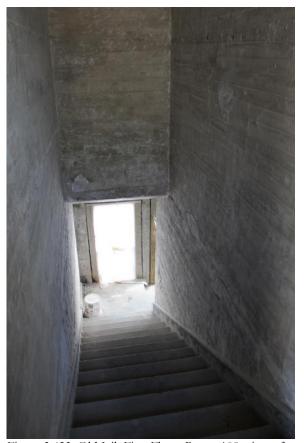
, Old Jail, First Floor, Room 108, view of stair from second story.
